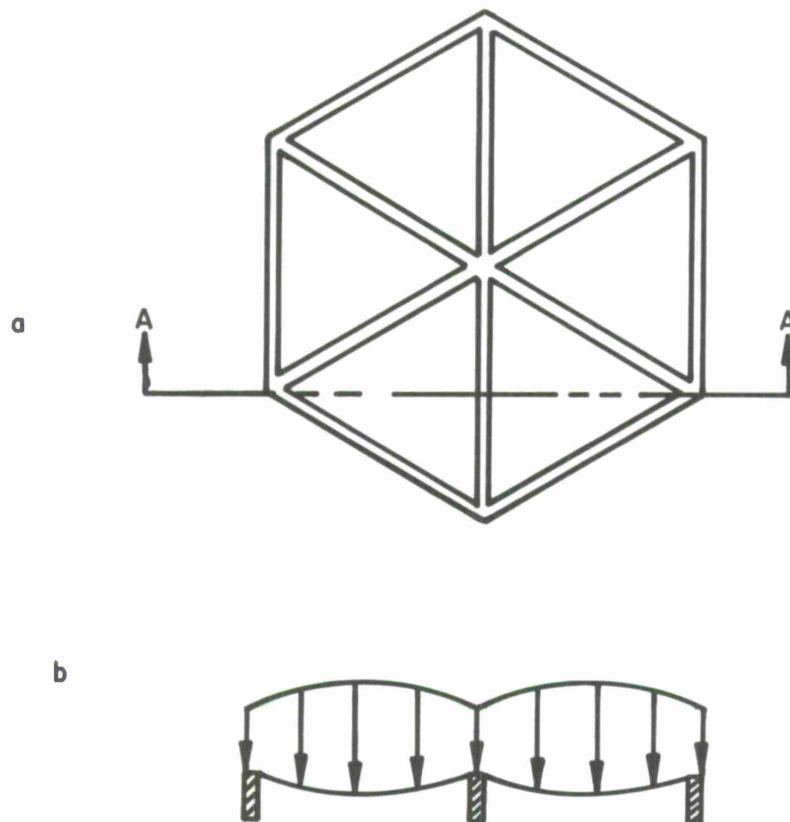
Typical radome panel grouping: a - Typical plane grouping. b - Section A.A of panel grouping.
